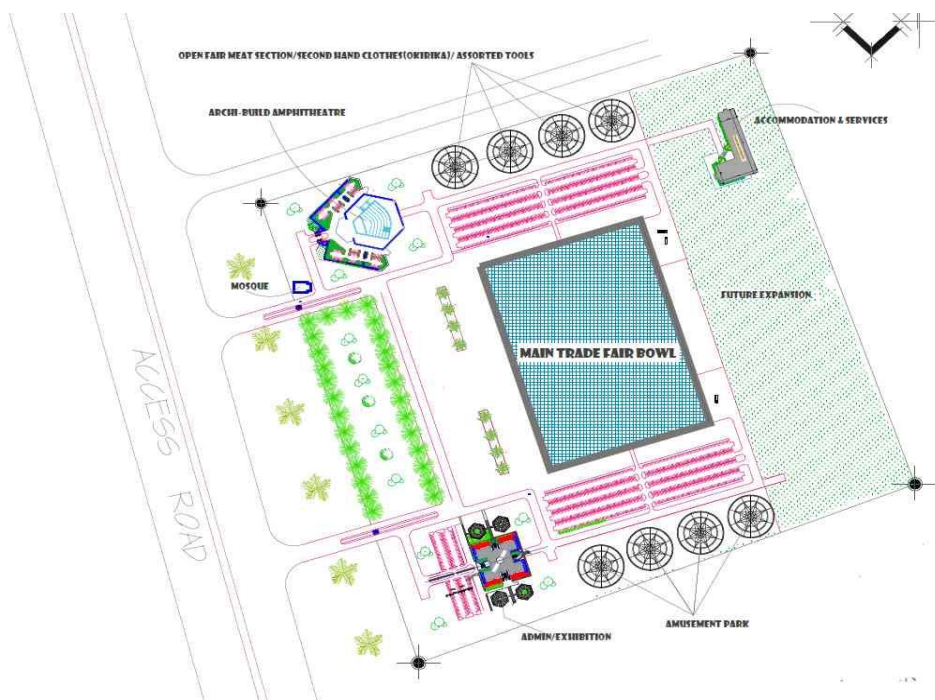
Site layout plan for the proposed Jalingo International Trade Fair Complex
